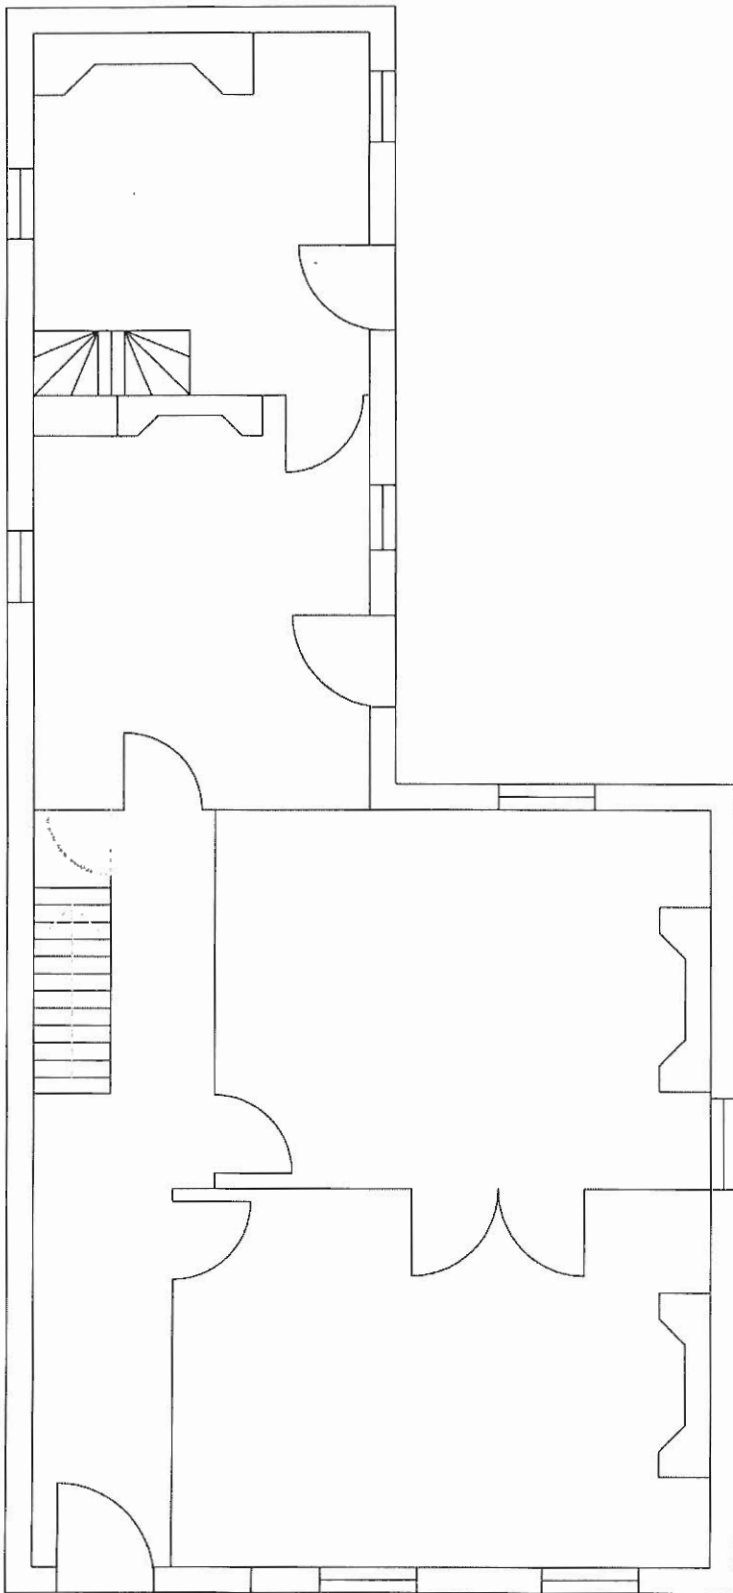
Floor plan of first floor after 1830s addition and renovation.
